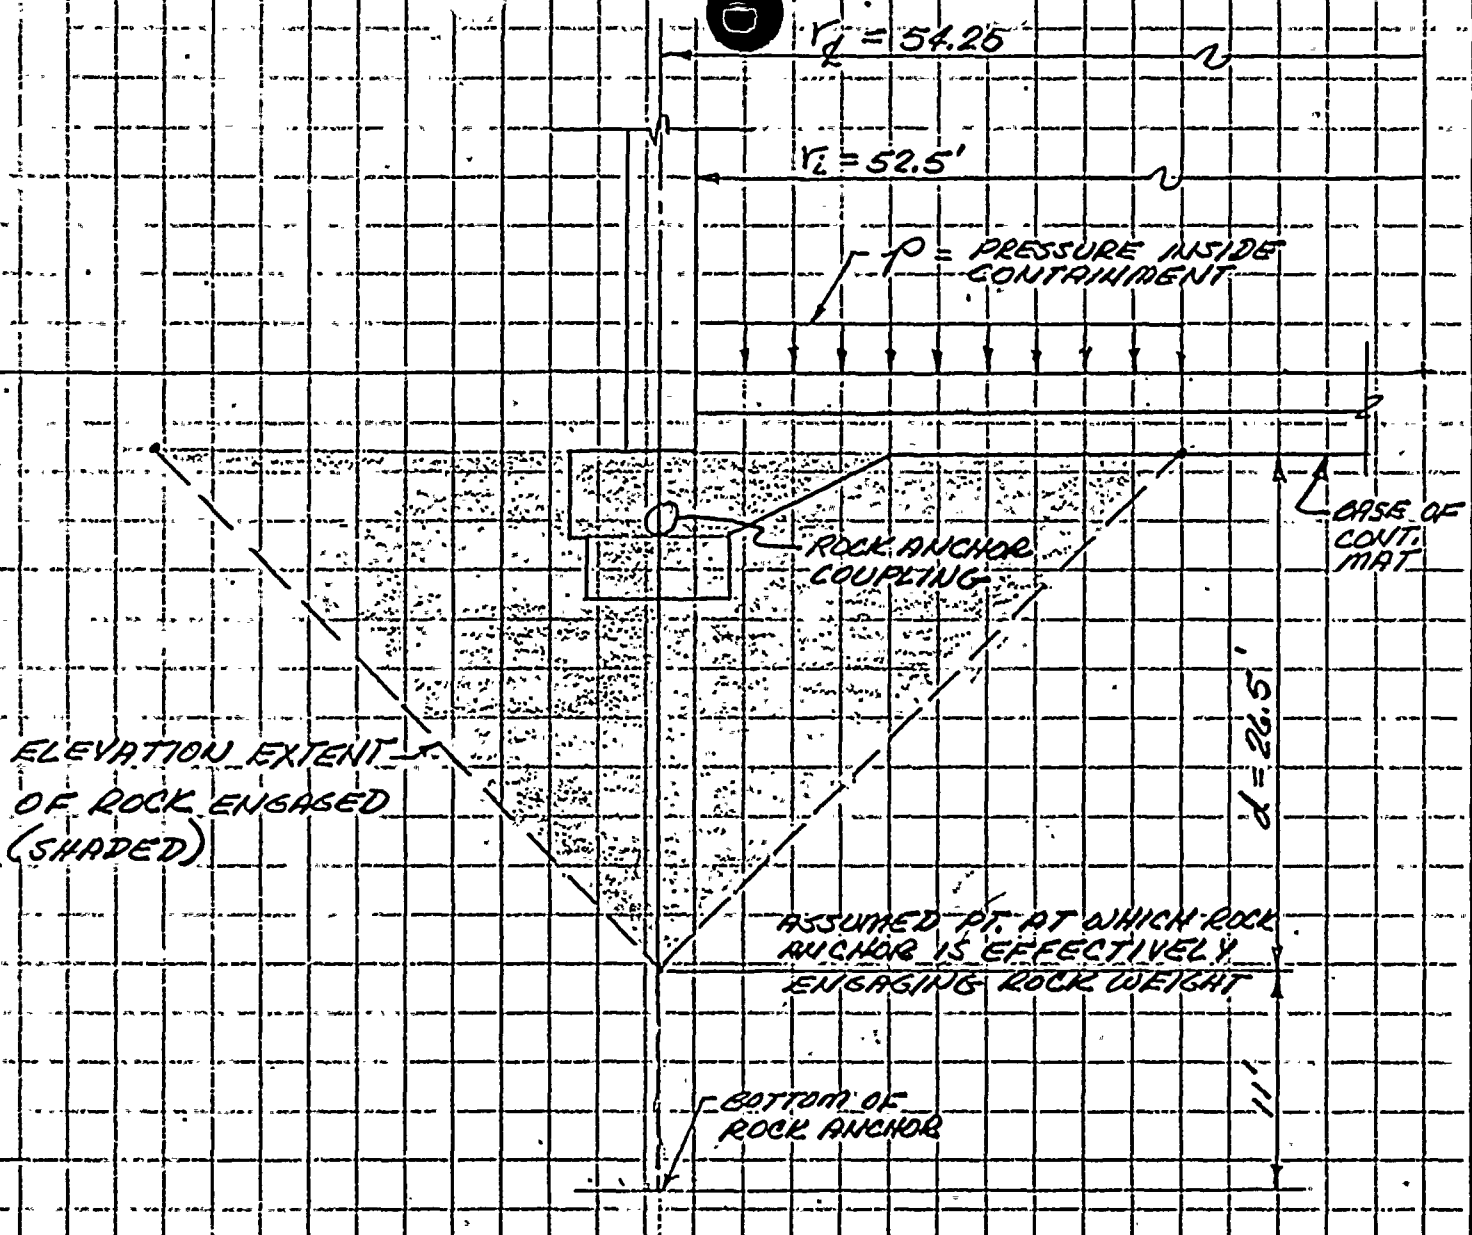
ELEVATION OF ROCK AND PRESSURE AREA
